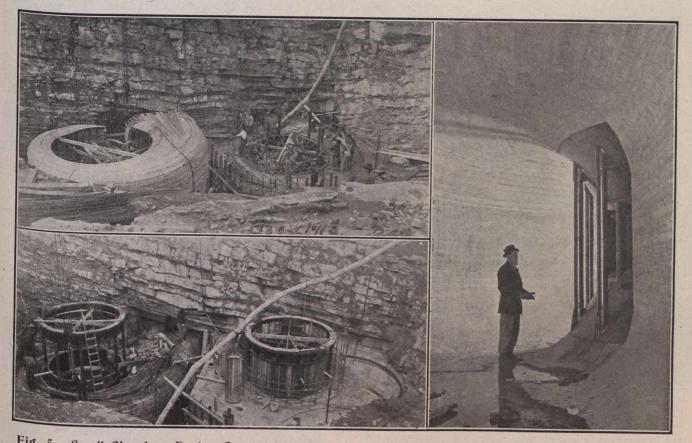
Scroll Chambers During Construction. Also Interior View of One with Forms Removed, Showing Turbine Frame in Place.
